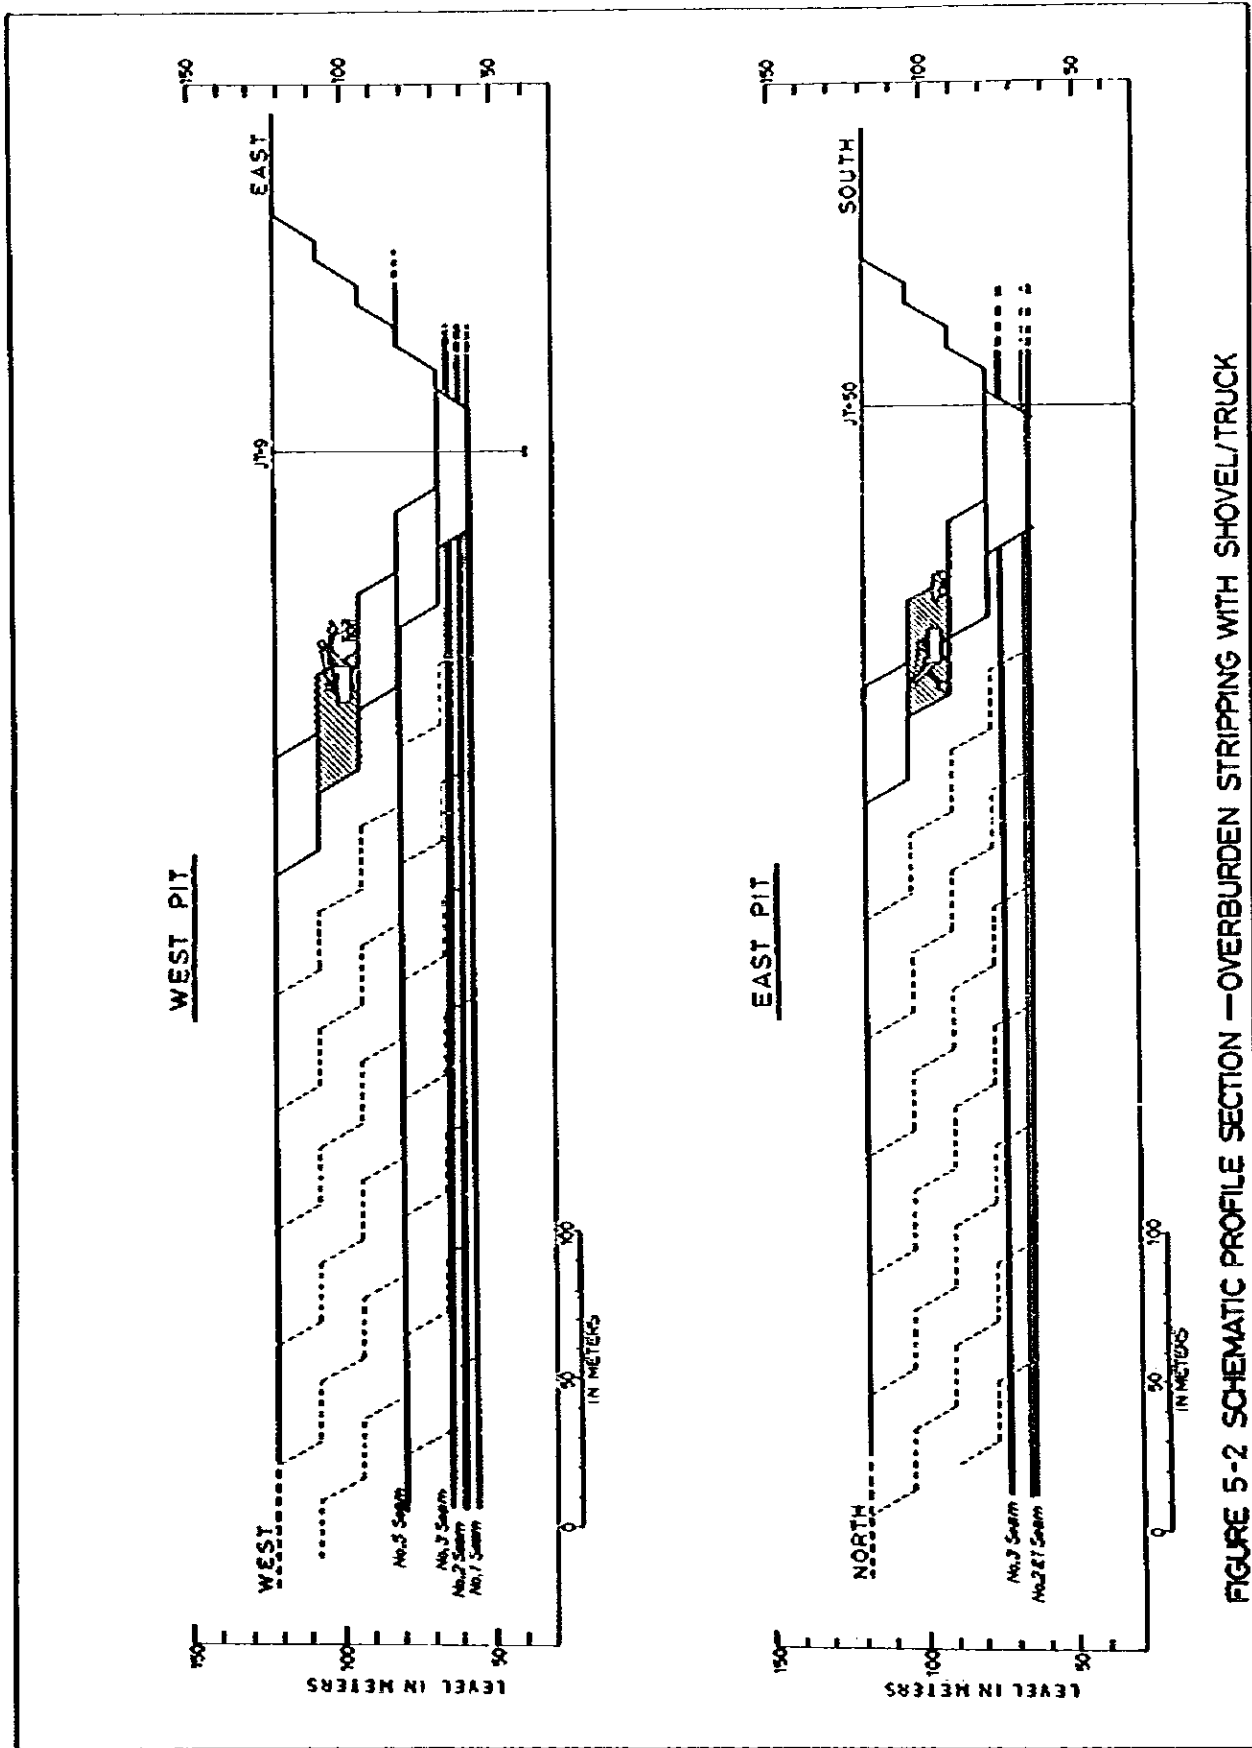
SCHEMATIC PROFILE SECTION — OVERBURDEN STRIPPING WITH SHOVEL/TRUCK
